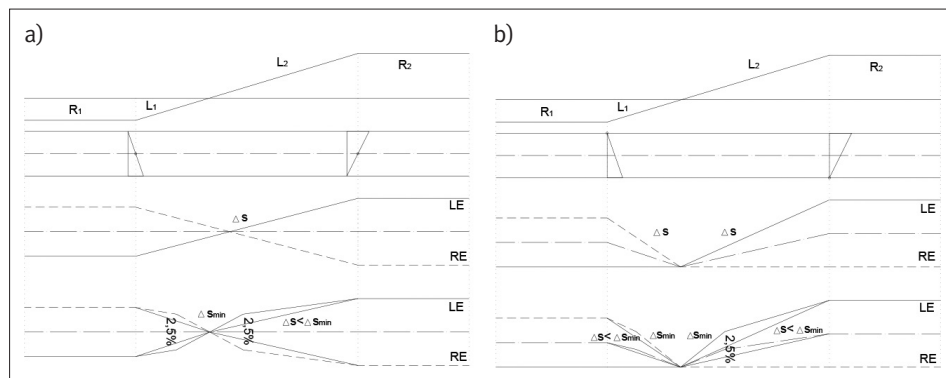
Reverse curves superlevation design: a) around pavement centerline (CRO, D, A) and b) around pavement edge (CRO, D)
